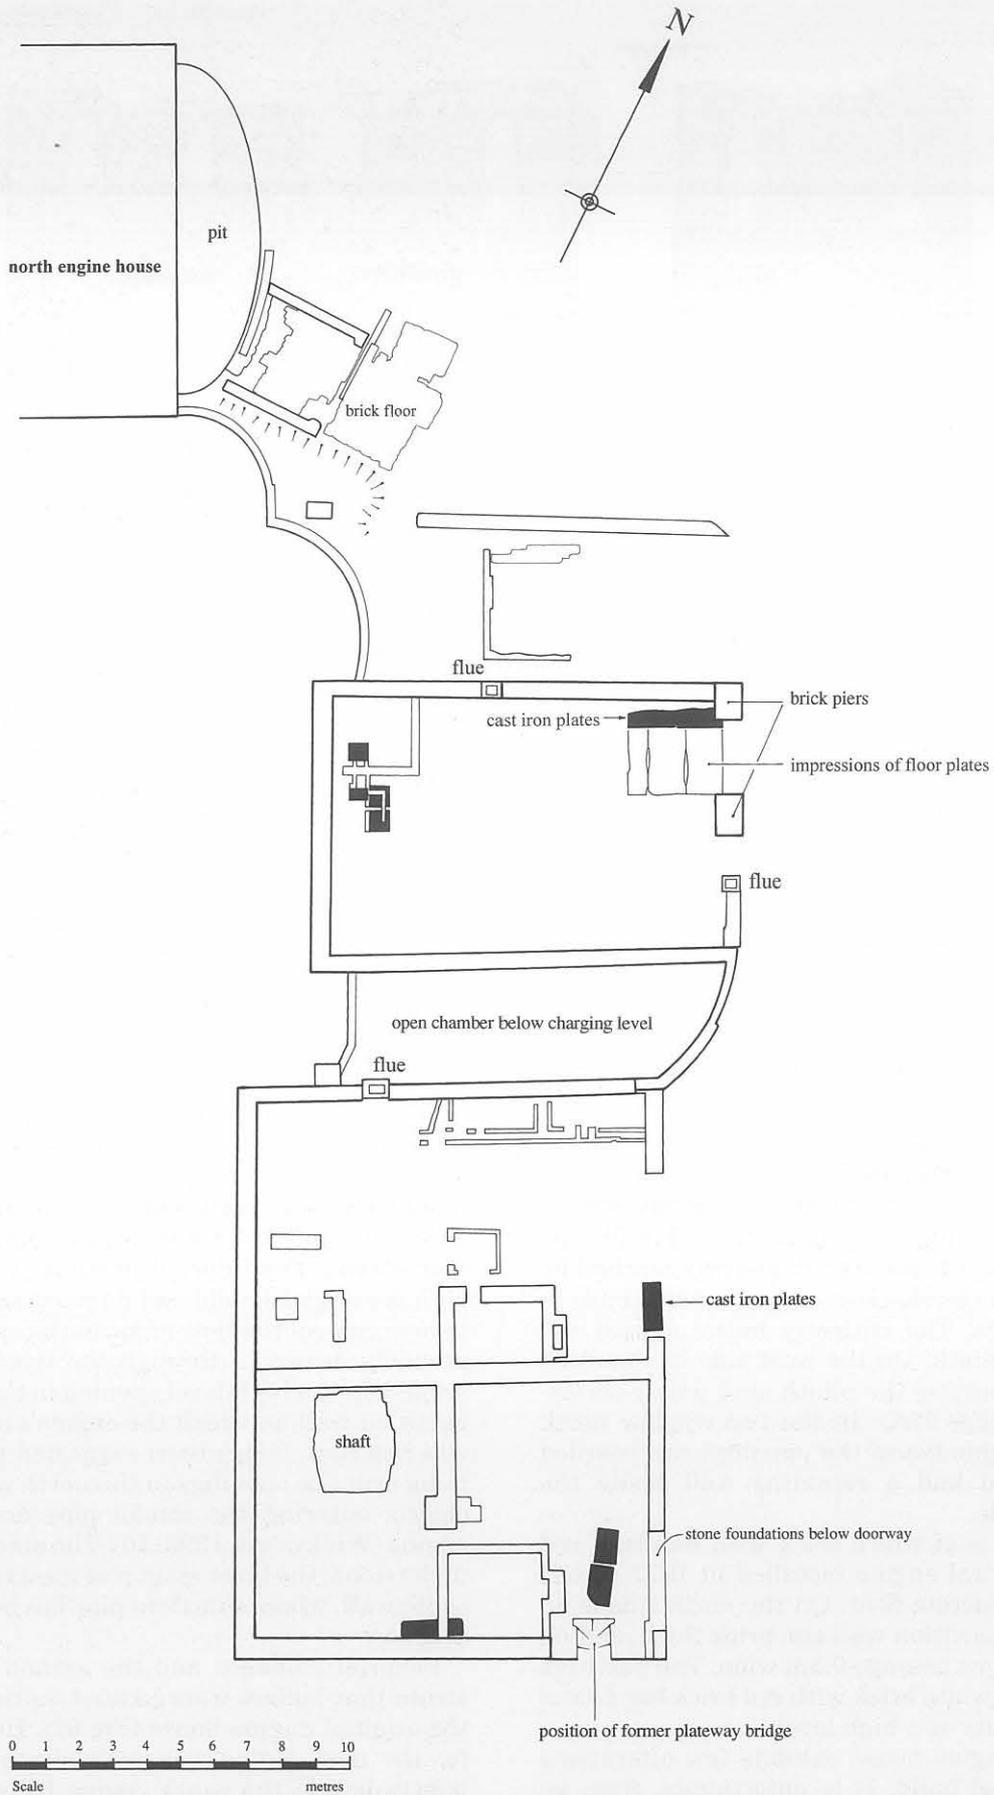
Plan of features exposed by excavations on the charging platform. The shaft in the south charging house is for the counterweight of the lift. The brick piers and wall north of the north charging house belong to the building that replaced the original charging houses.
